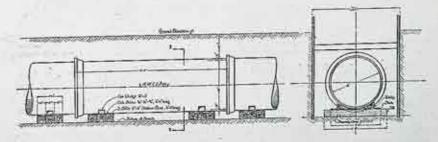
Elevation and Section of Cast Iron Pipe in the Trench.
